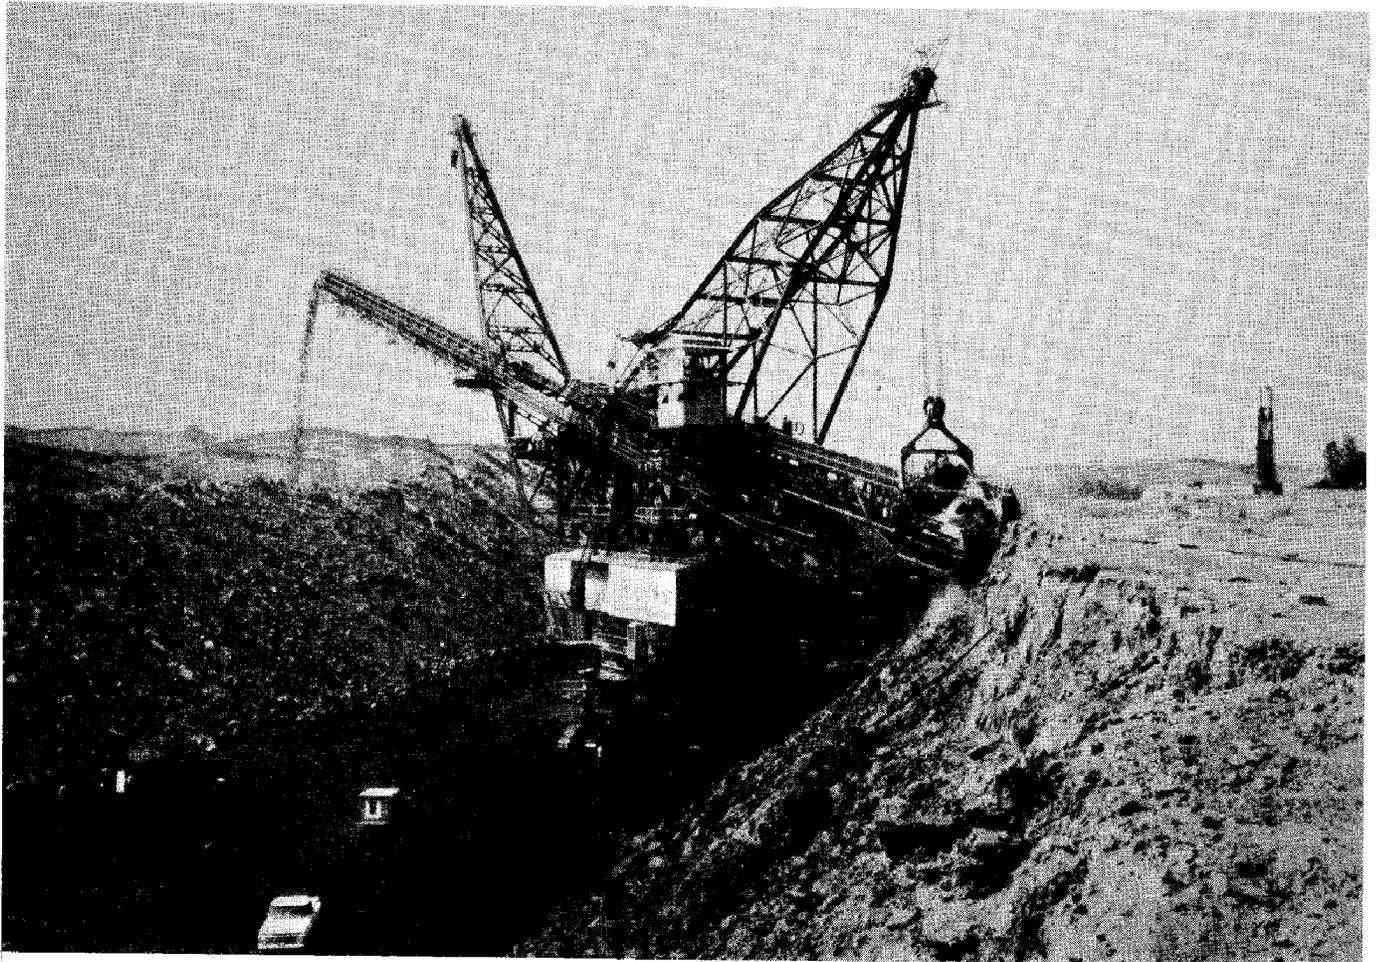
American Kolbe-Type Bucket-Wheel Excavator.
